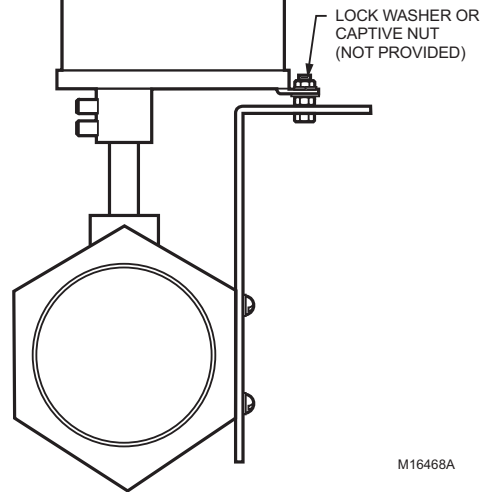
Mounting ML7999 with mounting bracket accessory.
